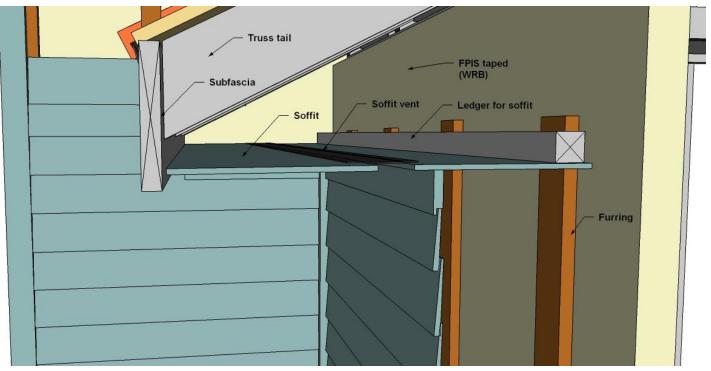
Top of Wall Standard Truss Eave Detail with Eave Ledger Attached to Structural Framing Through FPIS
